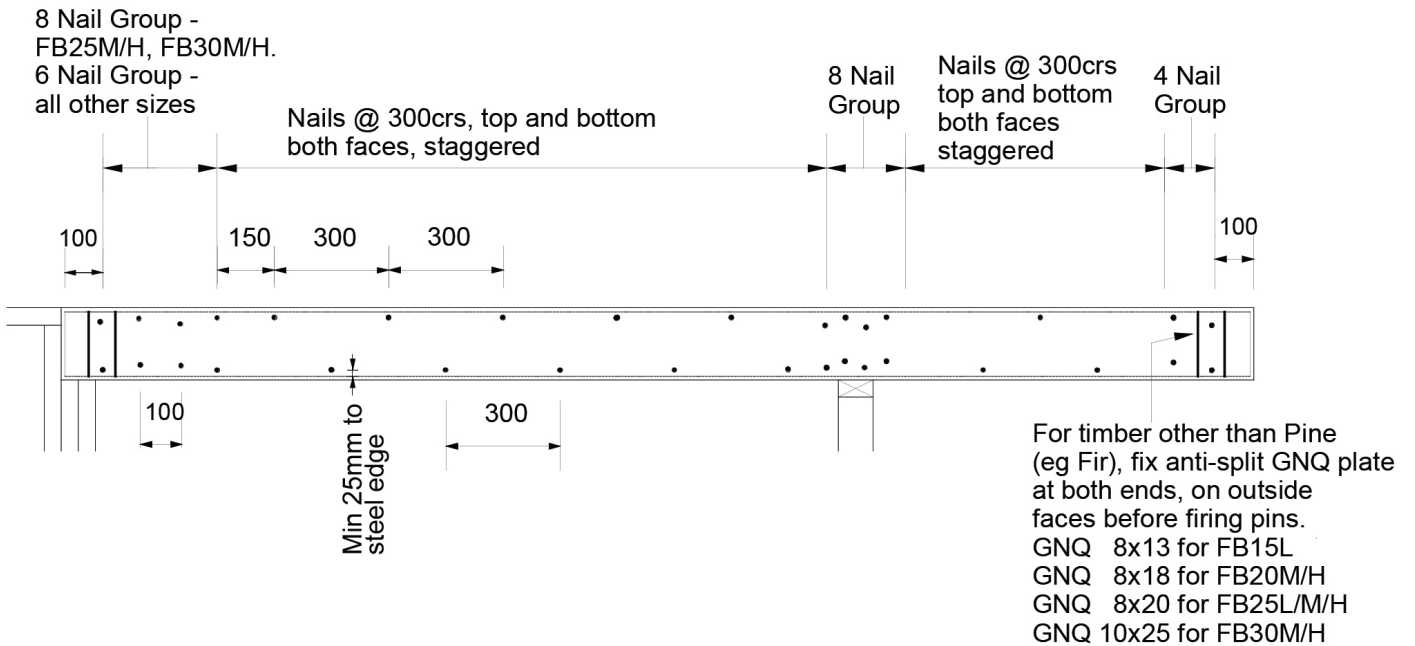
Typical Nailing Details for Cantilevered Beams (Both Faces)
